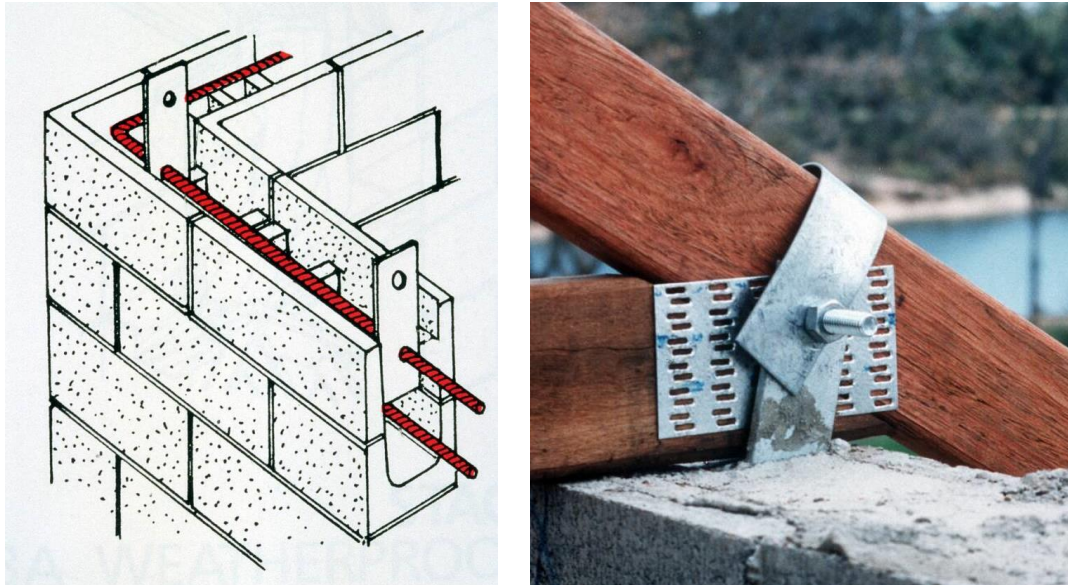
Bond beam reinforcing and truss cleat plate (left) and cleat plate with overstrap providing hold down to hardwood truss in cyclonic region (right)
